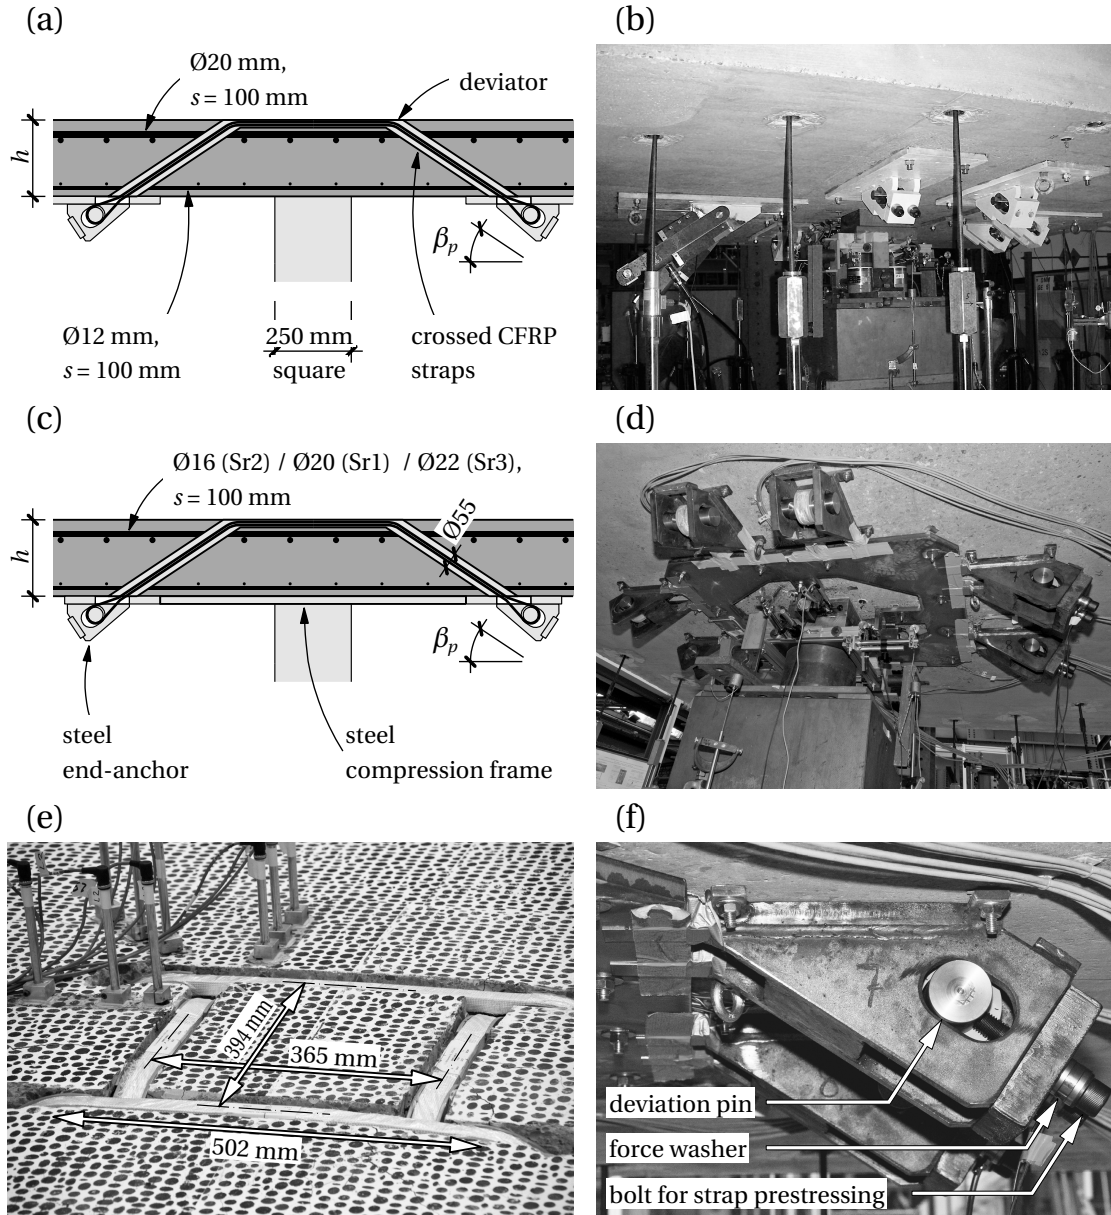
Adhesively-bonded anchors: (a) sectional and (b) bottom view (So1). Anchors connected by steel frame: (c) sectional and (d) bottom view (Sr1), (e) top view with crossed CFRP straps above central column (Sr2), and (f) detail view of end-anchor with force washer between anchor plate and bolt head (Sr1)
